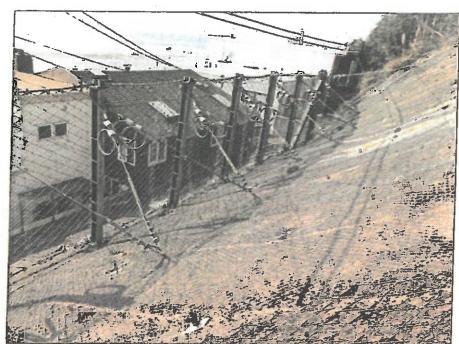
View of debris wall and Tecco mesh from down coast wing wall (15 November 2018)
